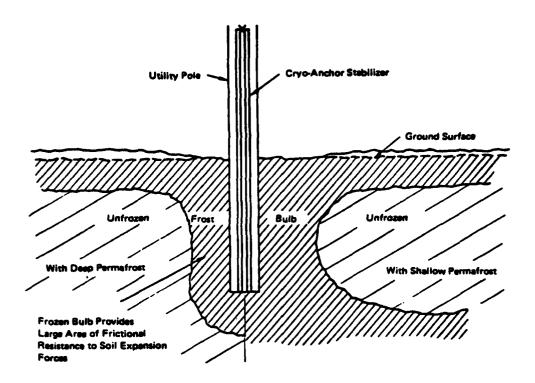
Prevention of pole-jacking through the use of Cryo-Anchors.
